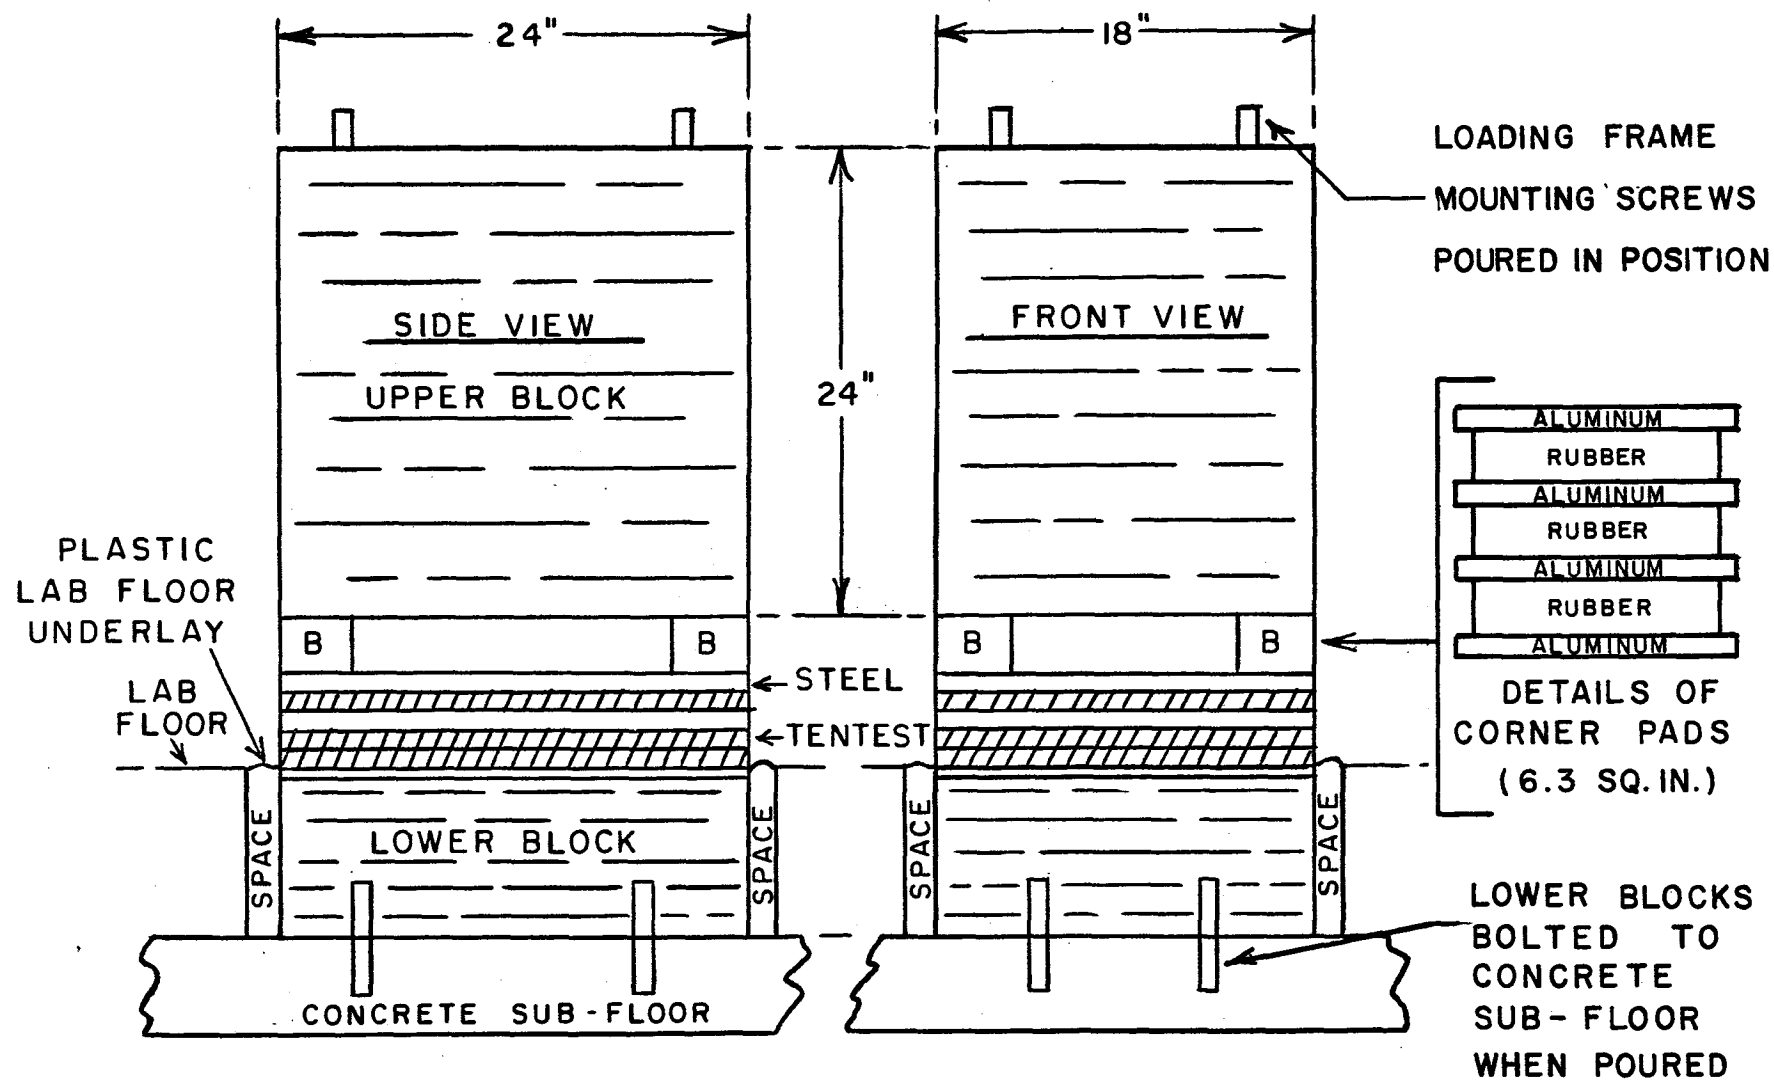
Construction Details of Antivibration Loading Frame Mounts.
